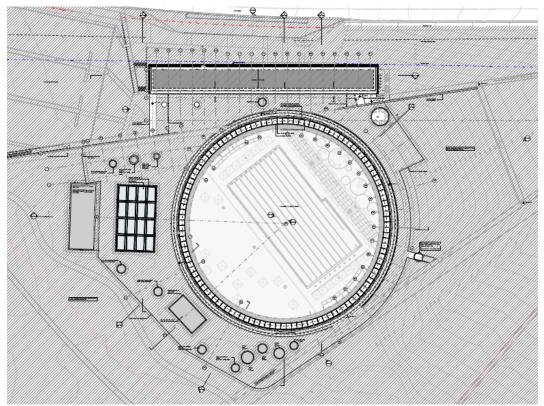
Roof Plan (Source: Grimshaw ABA, November 2020)
